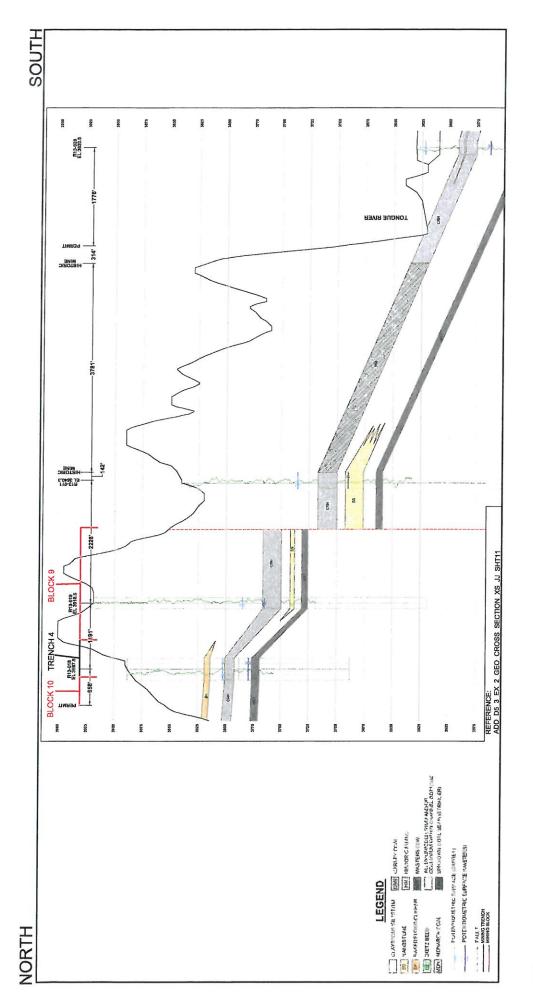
CROSS-SECTION J-J' SHOWING MINING BLOCK AND TRENCH EXTENTS FOR THE PROPOSED BROOK MINE
